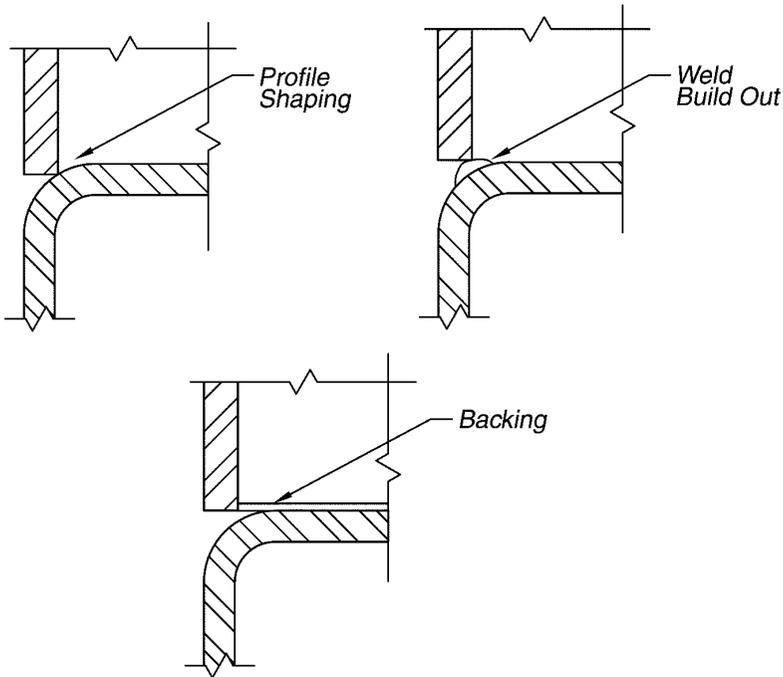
Welding methods accounting for the HSS corner radius.
